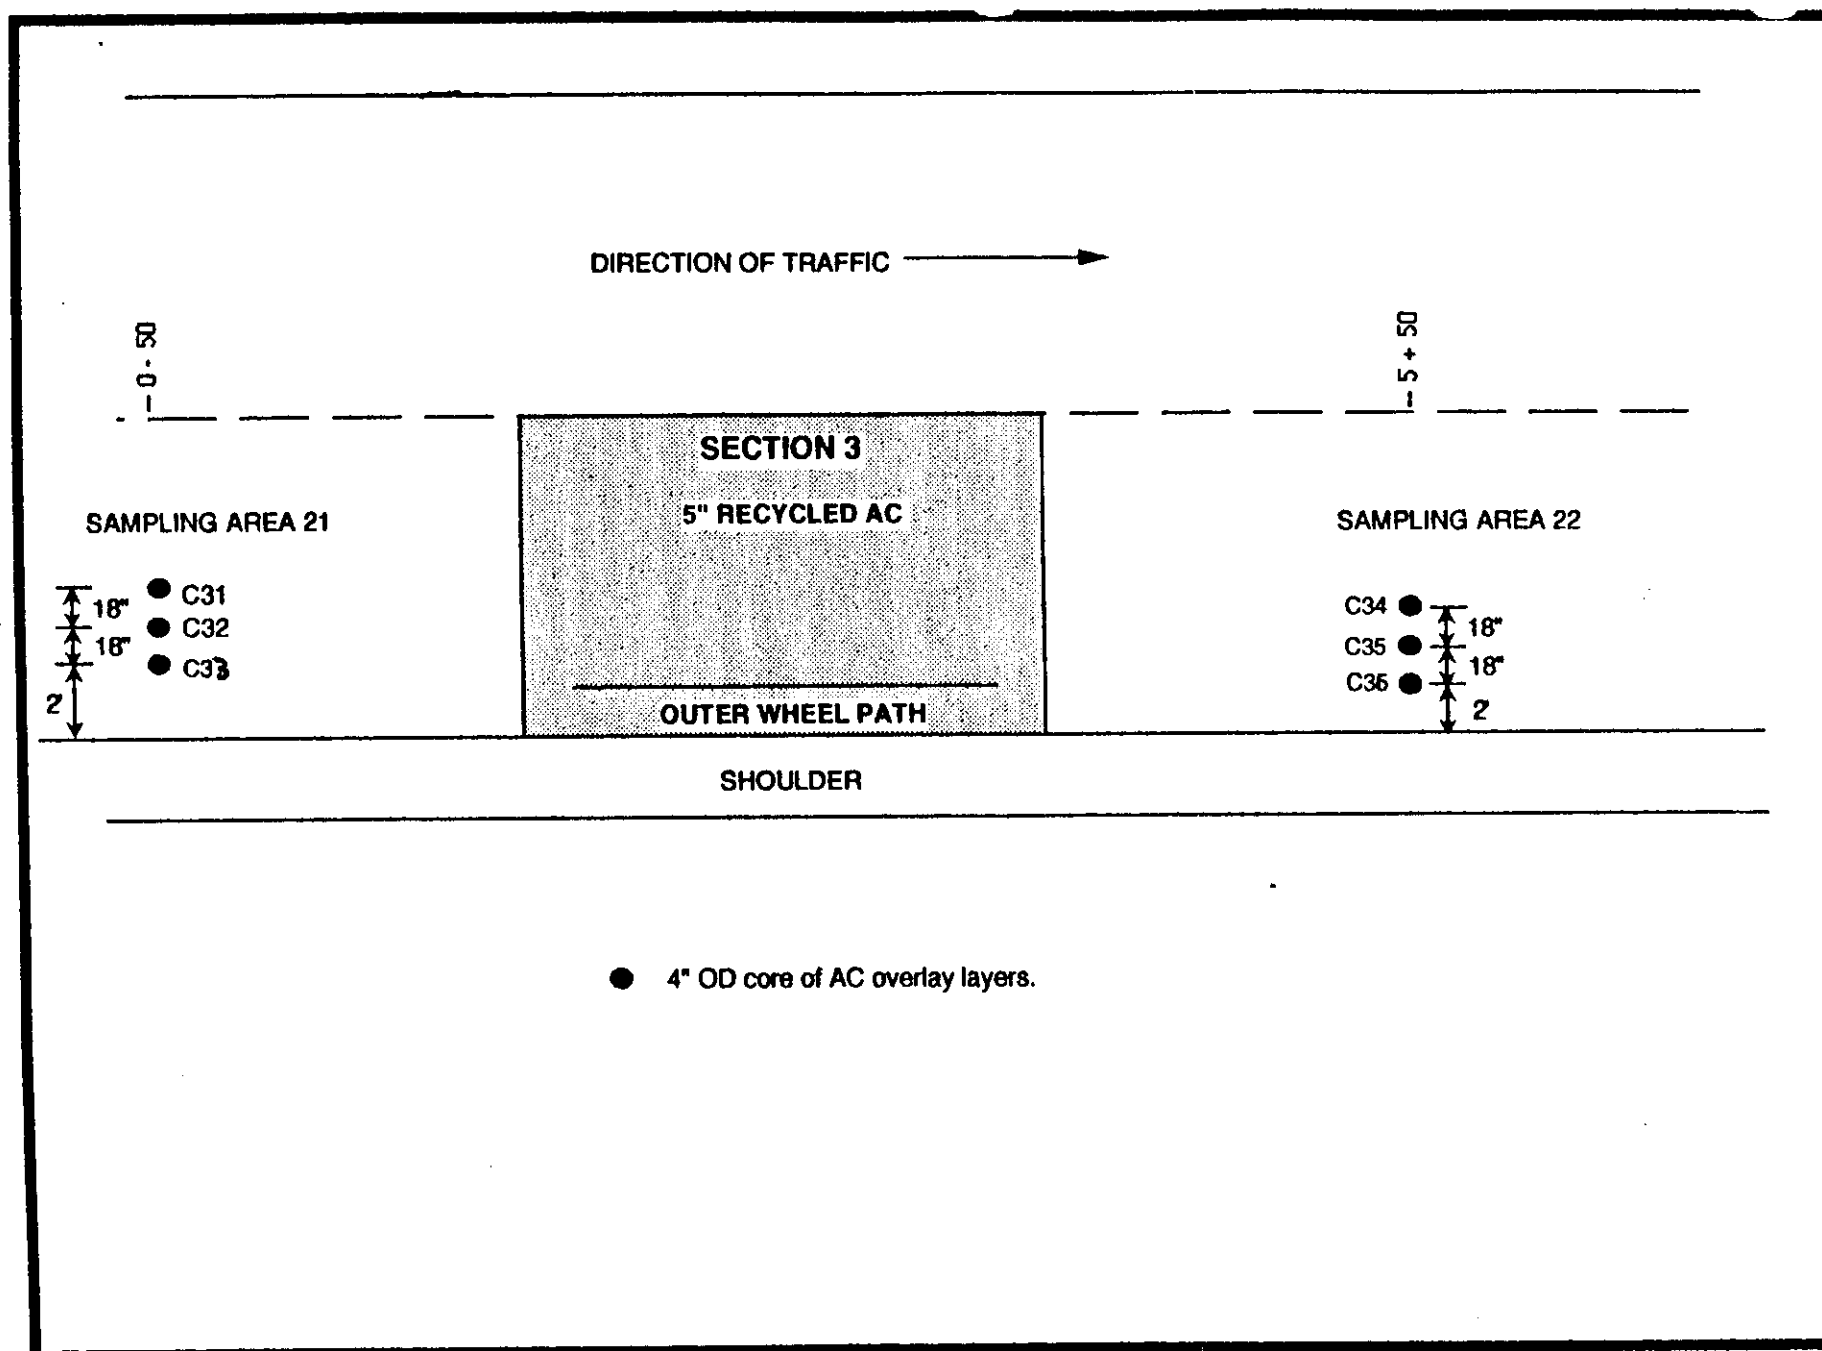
Example of "Post-Construction" Sampling Plan for Section 3.
